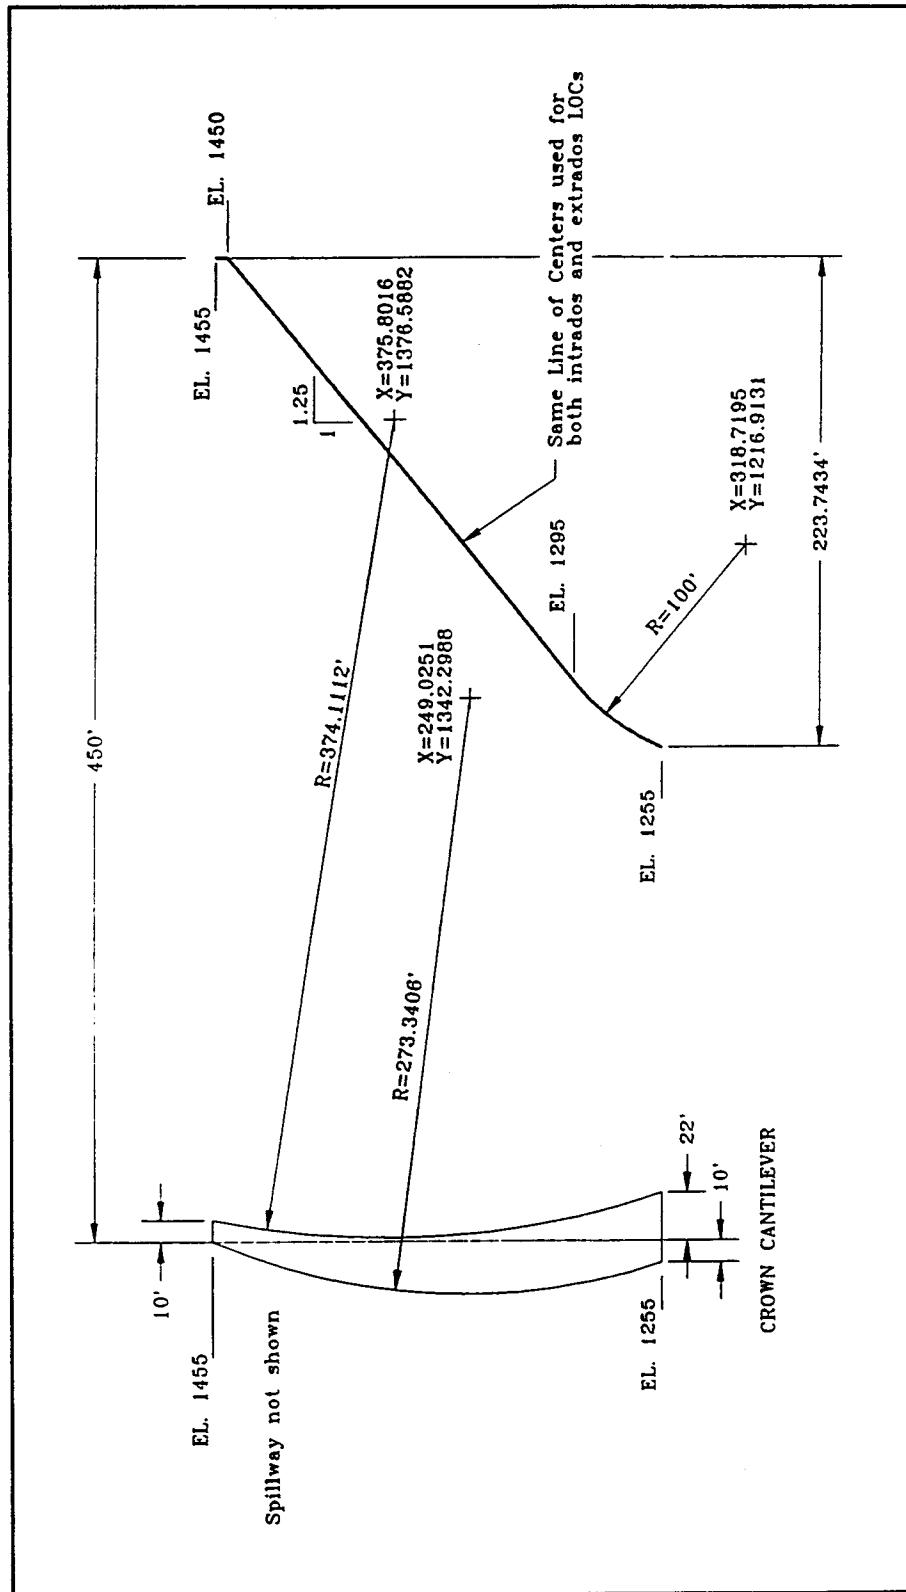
Crown cantilever and line of centers for a single-centered arch dam
